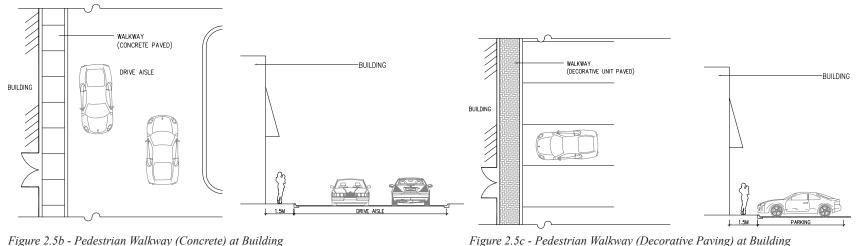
Pedestrian Walkway (Concrete) at Building
